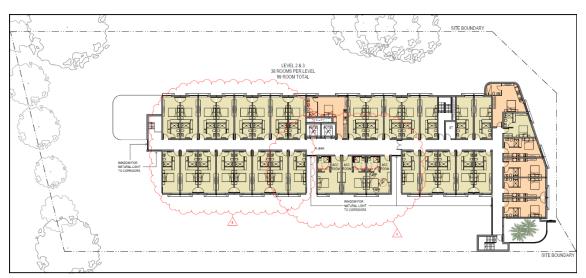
Proposed hotel level 3 plan (DA-104, Issue E)
